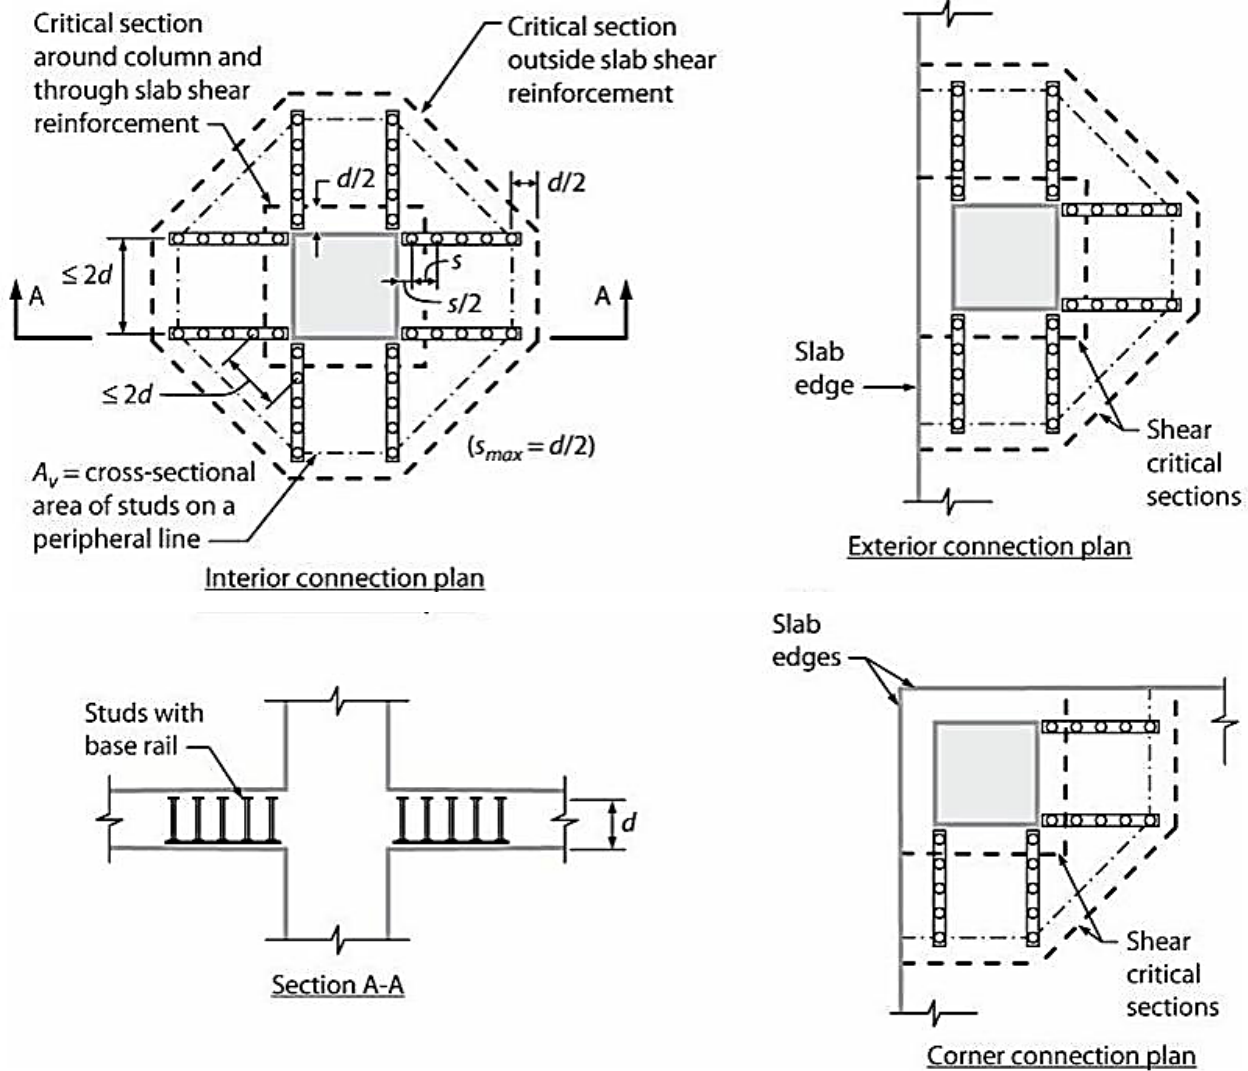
Typical arrangements of headed shear stud reinforcement and critical sections. (After ACI 318, 2014, and ACI 352.1, 2011, courtesy of American Concrete Institute.)
